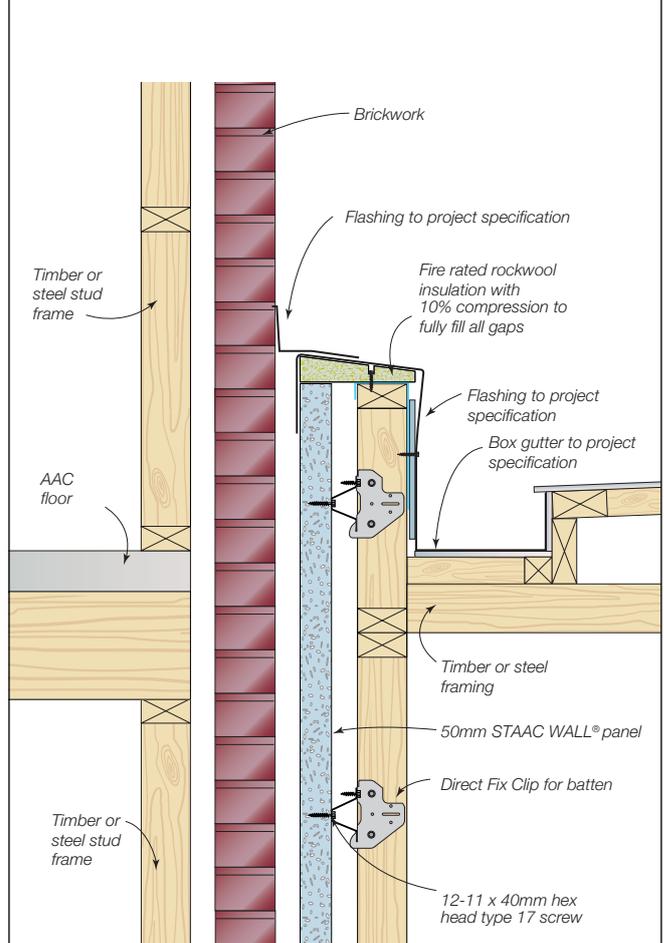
Dual Zero Boundary Wall detail to 50mm STAAC WALL® External Walls
